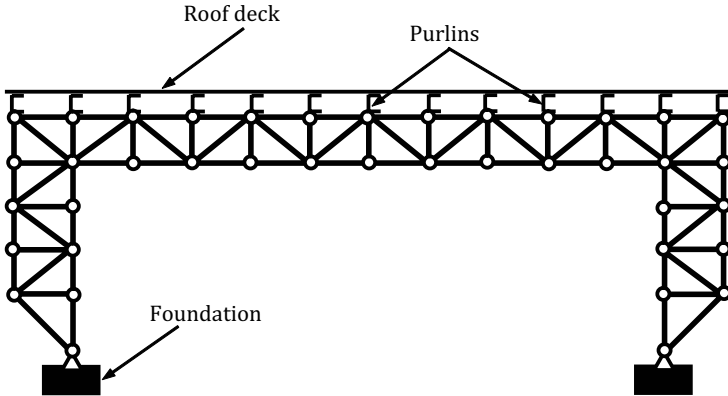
Large span pin-connected frame (side rails and cladding not shown).
